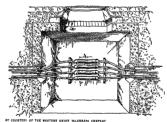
cross section of a manhole showing the cable ducts and joint rack
